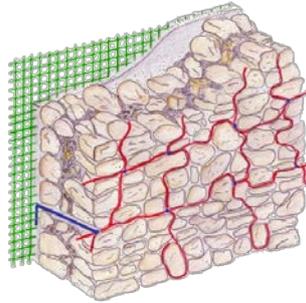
Panel n. 1 – reinforcement approach: Reticolatus(external surface) and GFRP reinforced plaster (internal surface).
